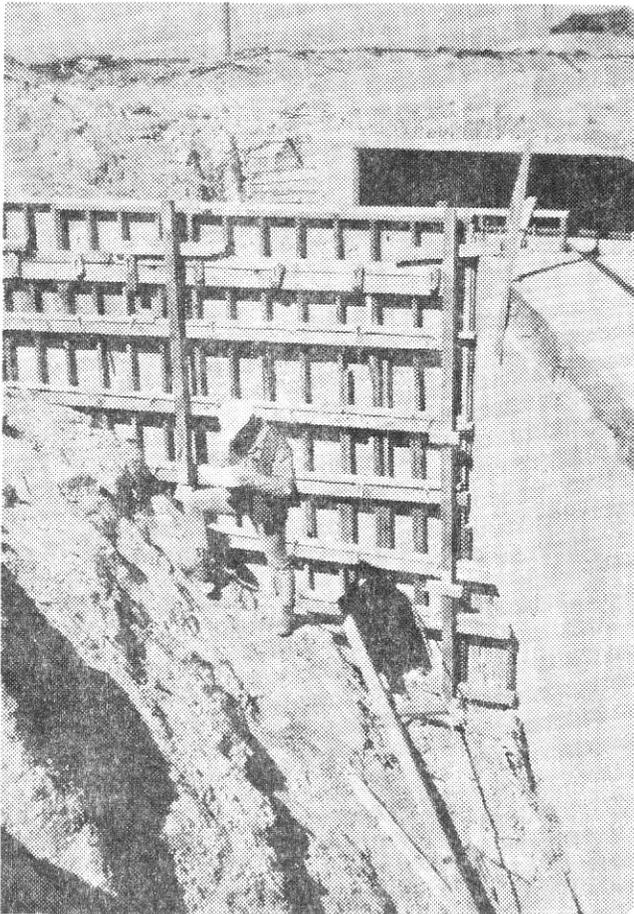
Abutment prior to backfilling at the Via Princessa Undercrossing.
